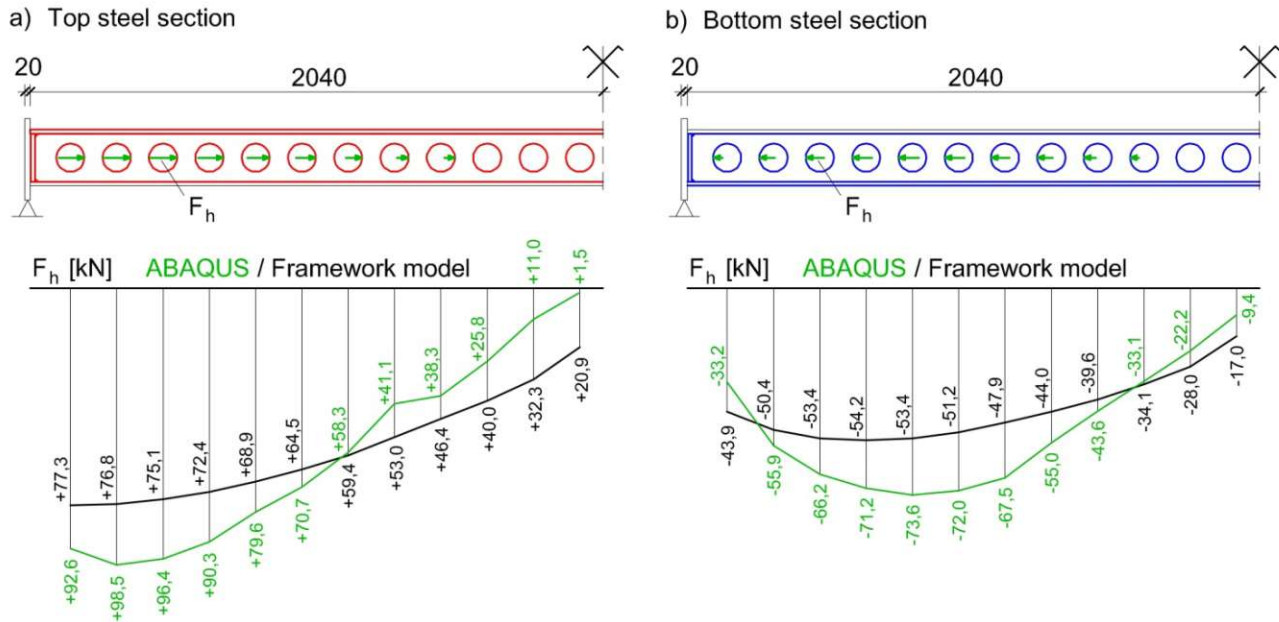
Horizontal forces in the shear connectors of the SCSC-plate: a) forces in the top steel section; b) forces in the bottom steel section. Dimensions in [mm]
